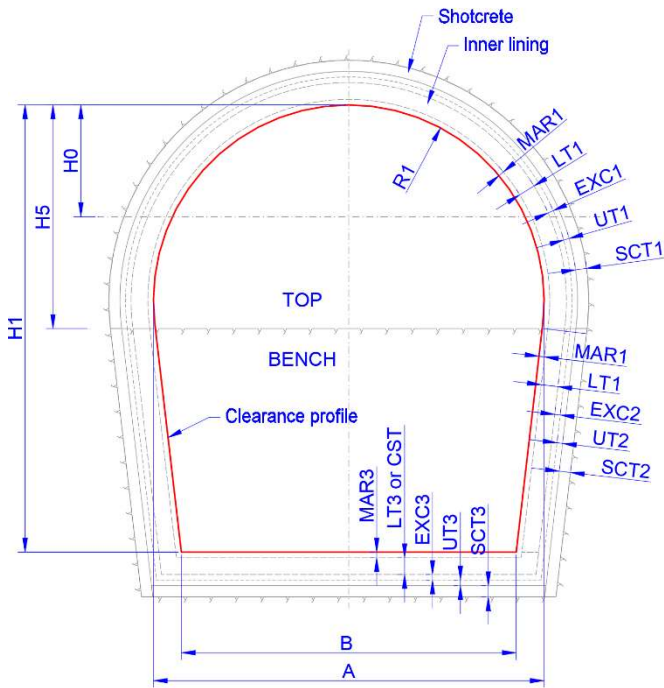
Cross section Type 2, phase 1 and 2 excavation (EXPH=3)
